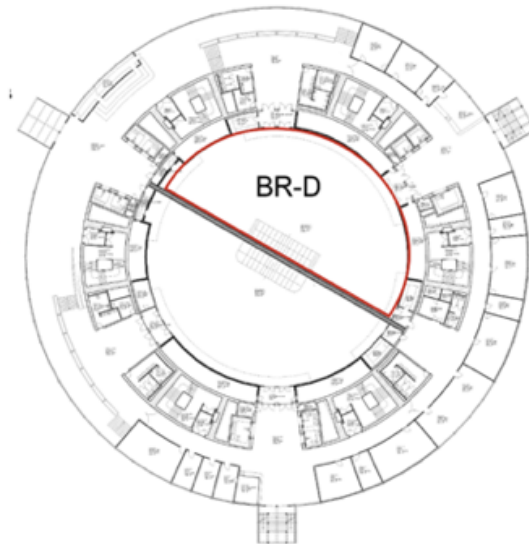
Plan of the 4th floor, C Building, VIC⁷
